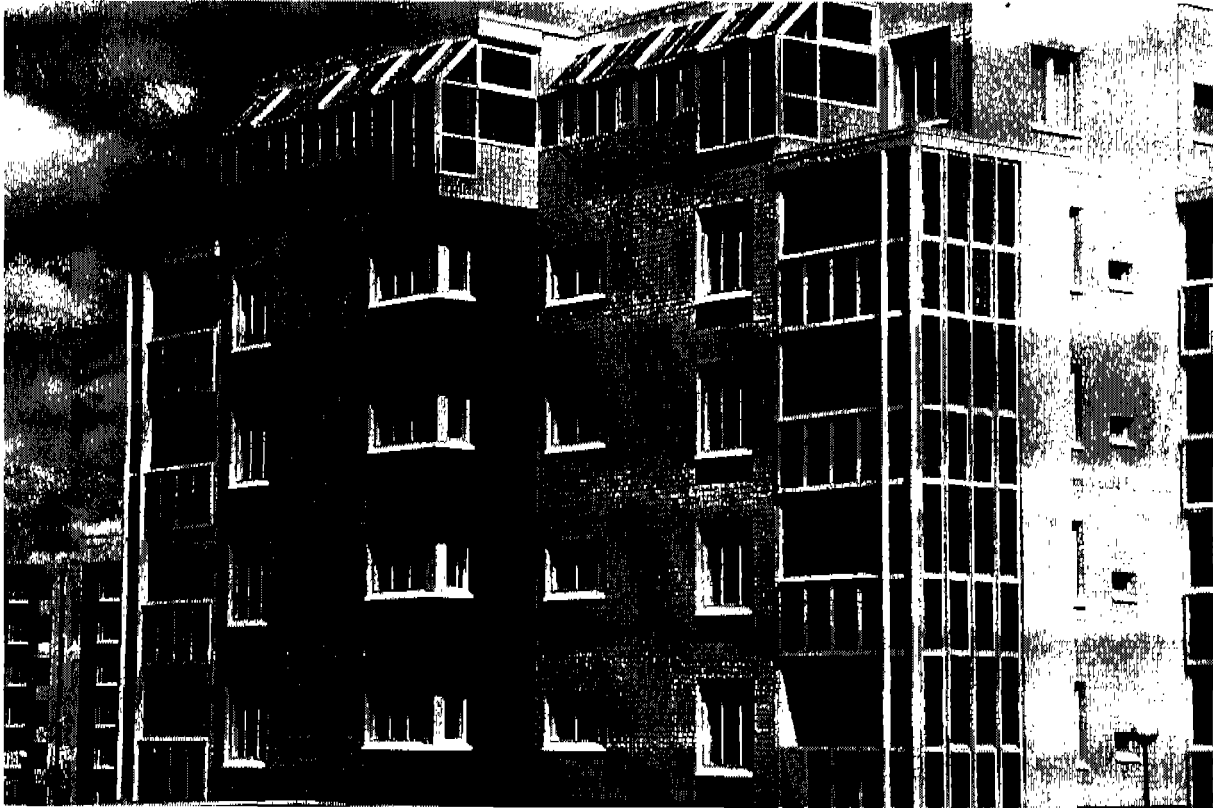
A block of flats with mechanical supply and exhaust ventilation unit in each flat and a wall exhaust solution. Outdoor air intakes and exhaust air openings are located in the same facade. Wall exhaust openings have longer shadows than outdoor air intakes.
